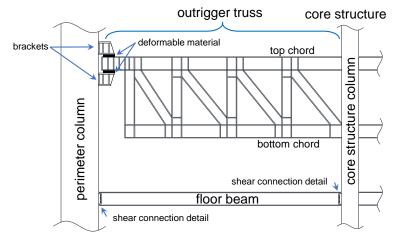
Illustration of conventional outrigger with stoppers detail at outrigger end
